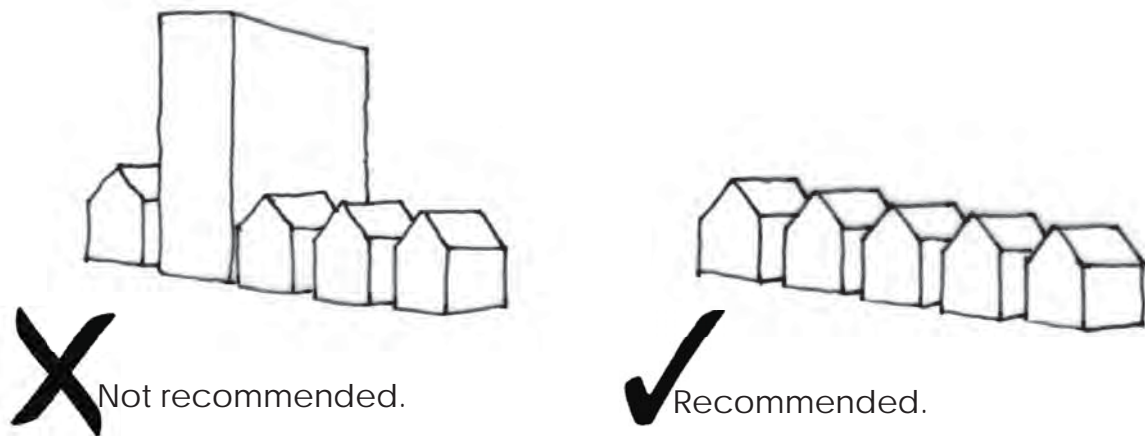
Design new buildings with respect towards the average height, width, and site placement of historic buildings in the surrounding neighborhood. *Source: JMA collection.
